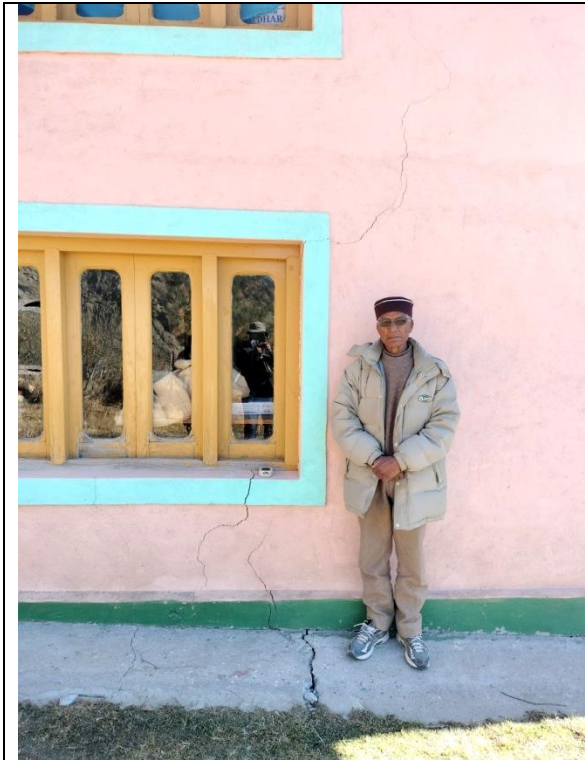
Ground cracks continuing as diagonal cracks into the walls of a house.
